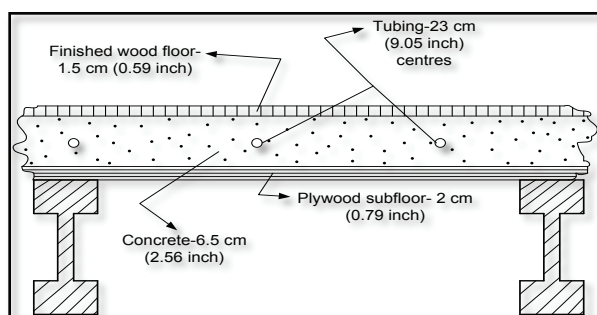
Radiant in-floor heating of “thin slab over frame floor” system
